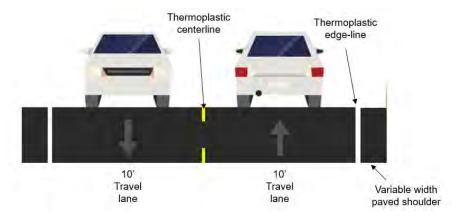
Proposed Cross Section at East Street, West Street, and Hector Street
